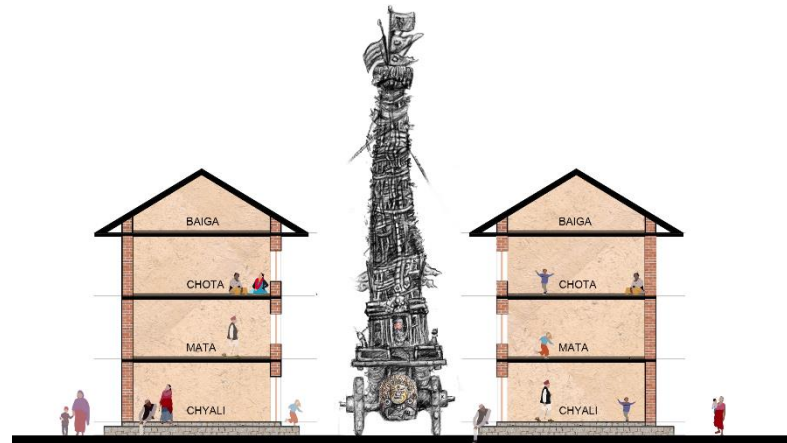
Section of Asan-Bhotahity Road showing Seto Machindranath Jatra(Past)
